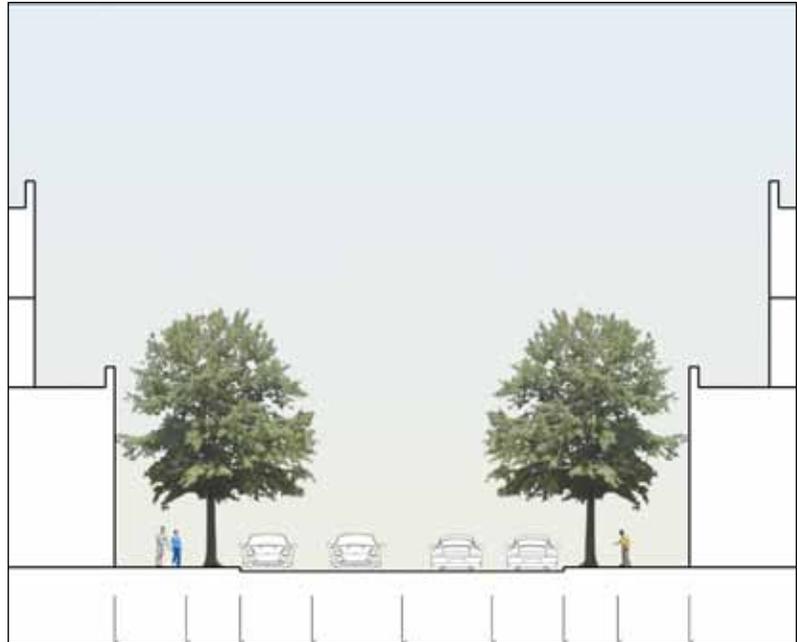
Residential streets provide two shared lanes for cars and bicycles, with two parking lanes, a planting strip and sidewalk.
